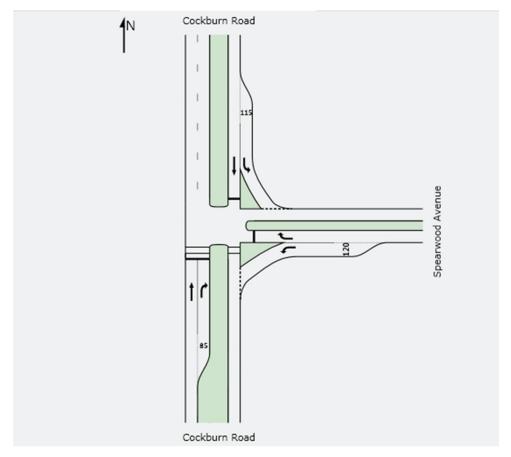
SIDRA layout for Cockburn Road / Spearwood Avenue intersection
